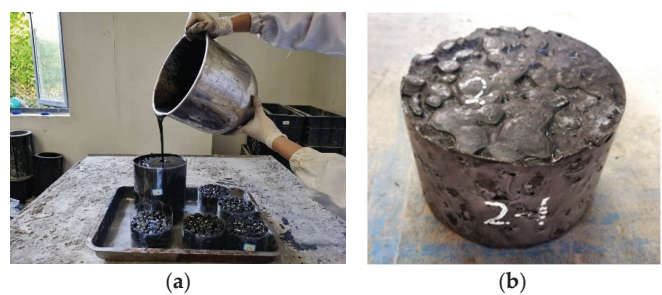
SFP specimen fabrication: (a) filling cement grout; (b) cured SFP specimen.
